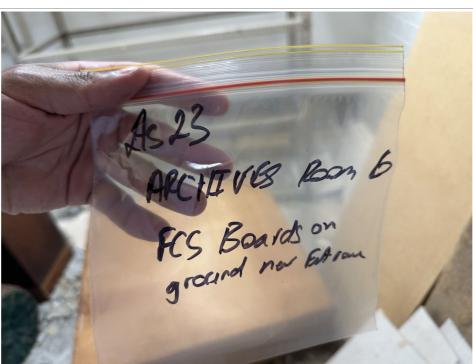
DKB – Sample 23 (S23): Sample of FCS floorboards
